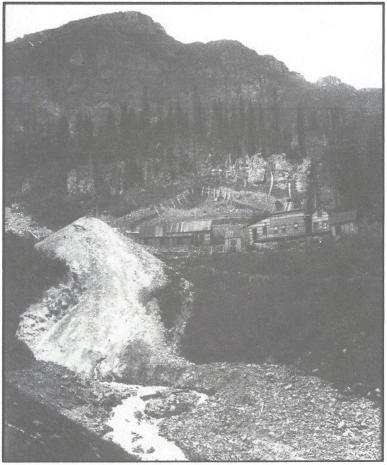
Silver Crown Mine showing the buildings constructed in 1906 with the avalanche splitting berms on the slope above.
